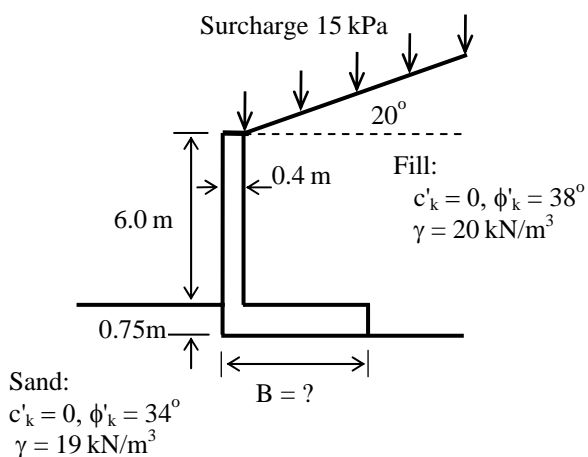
(d) Example 4 – Cantilever gravity retaining wall
